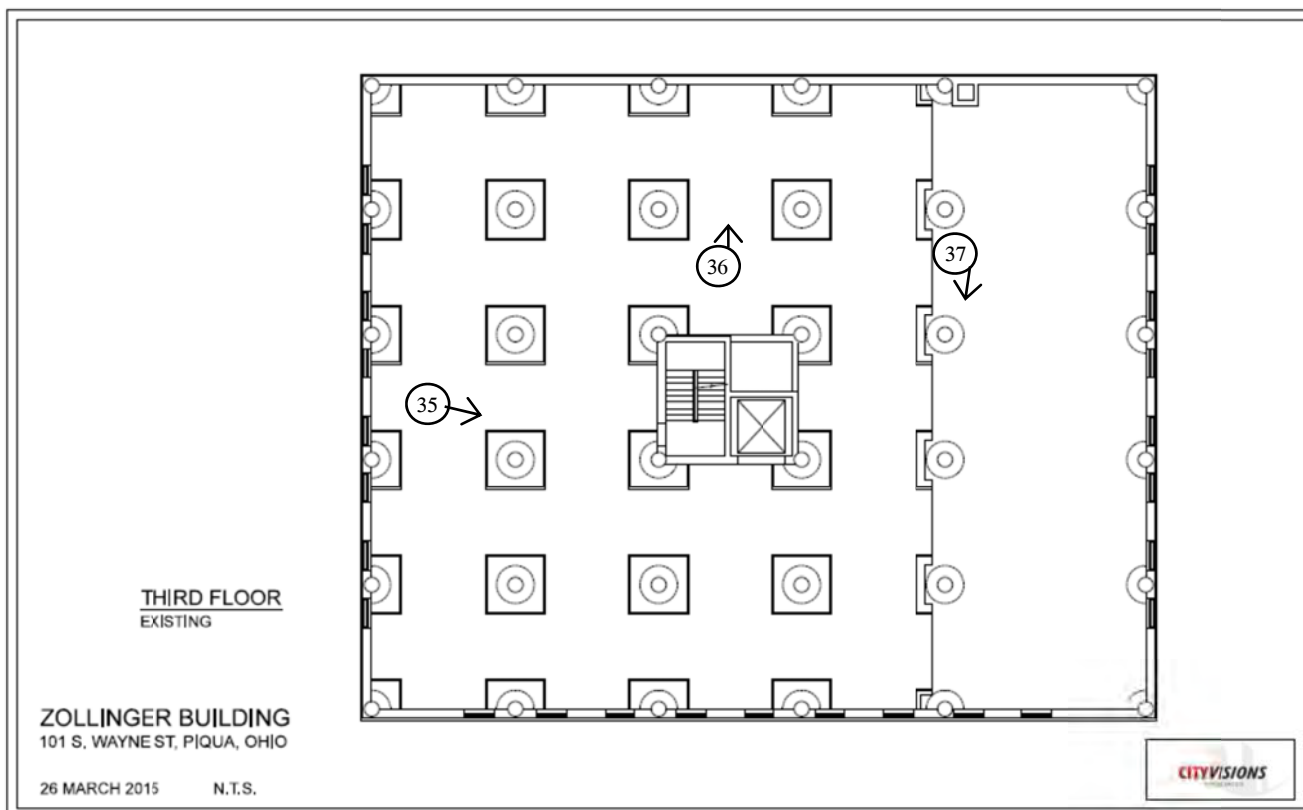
Existing Third Floor Plan, Zollinger Building showing locations of photographs 35-37 (City Visions, Inc.)
